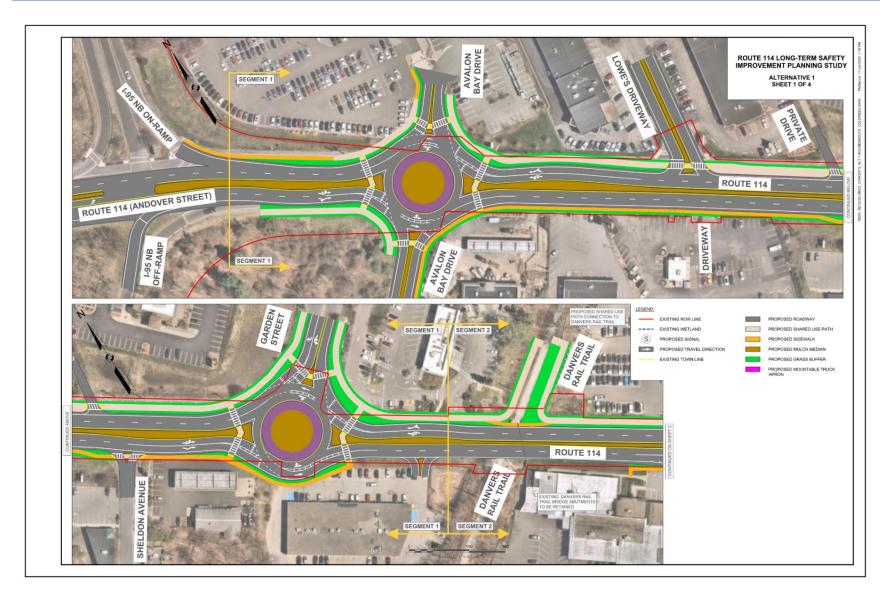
Avalon Bay Drive to Garden Street with Roundabouts provided to facilitate U-Turns in Alternative 1
